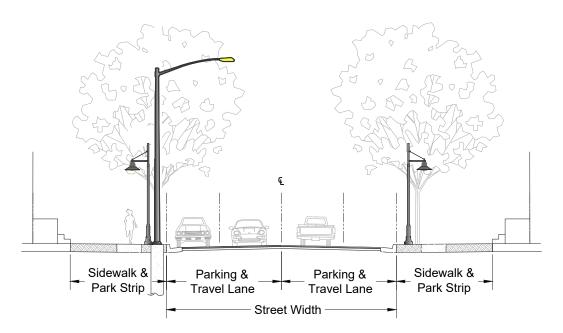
Typical Local Street with Continuous Pedestrian Lighting Cross Section
